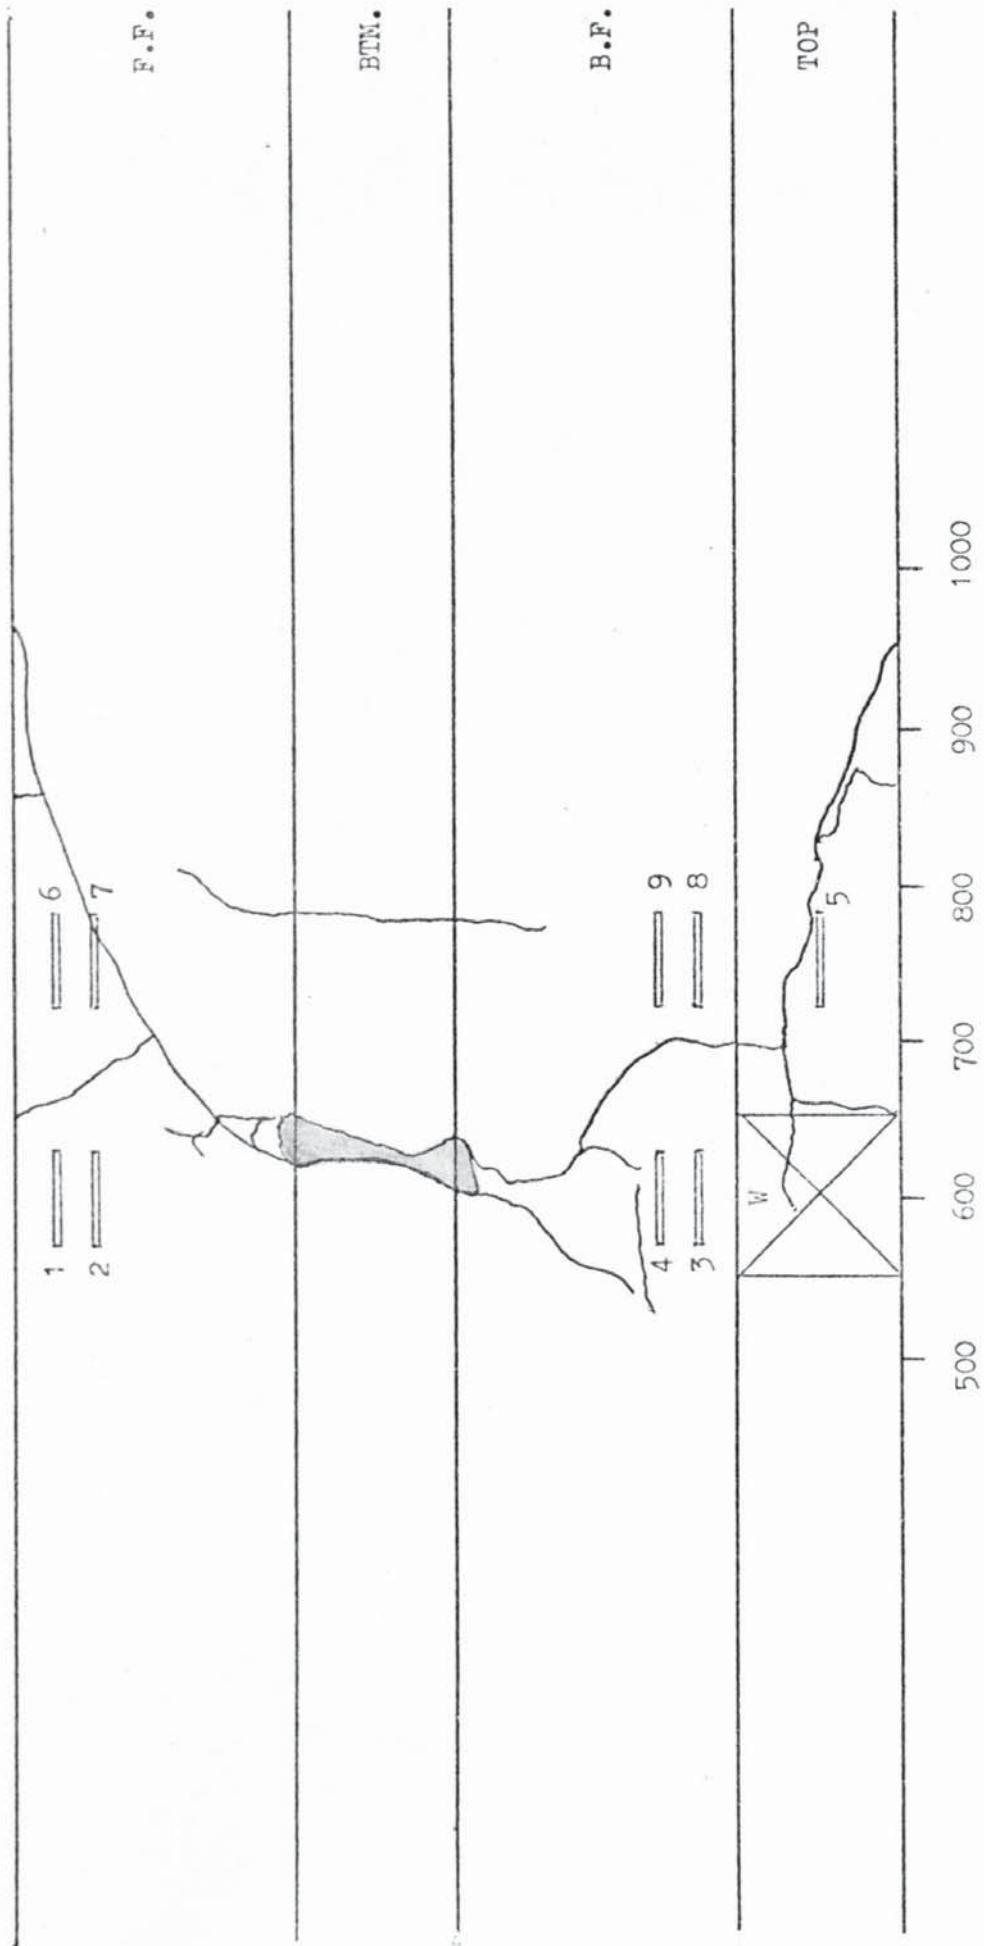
FAILURE CRACK PATTERNS - BEAM 18 (MODE 1)
